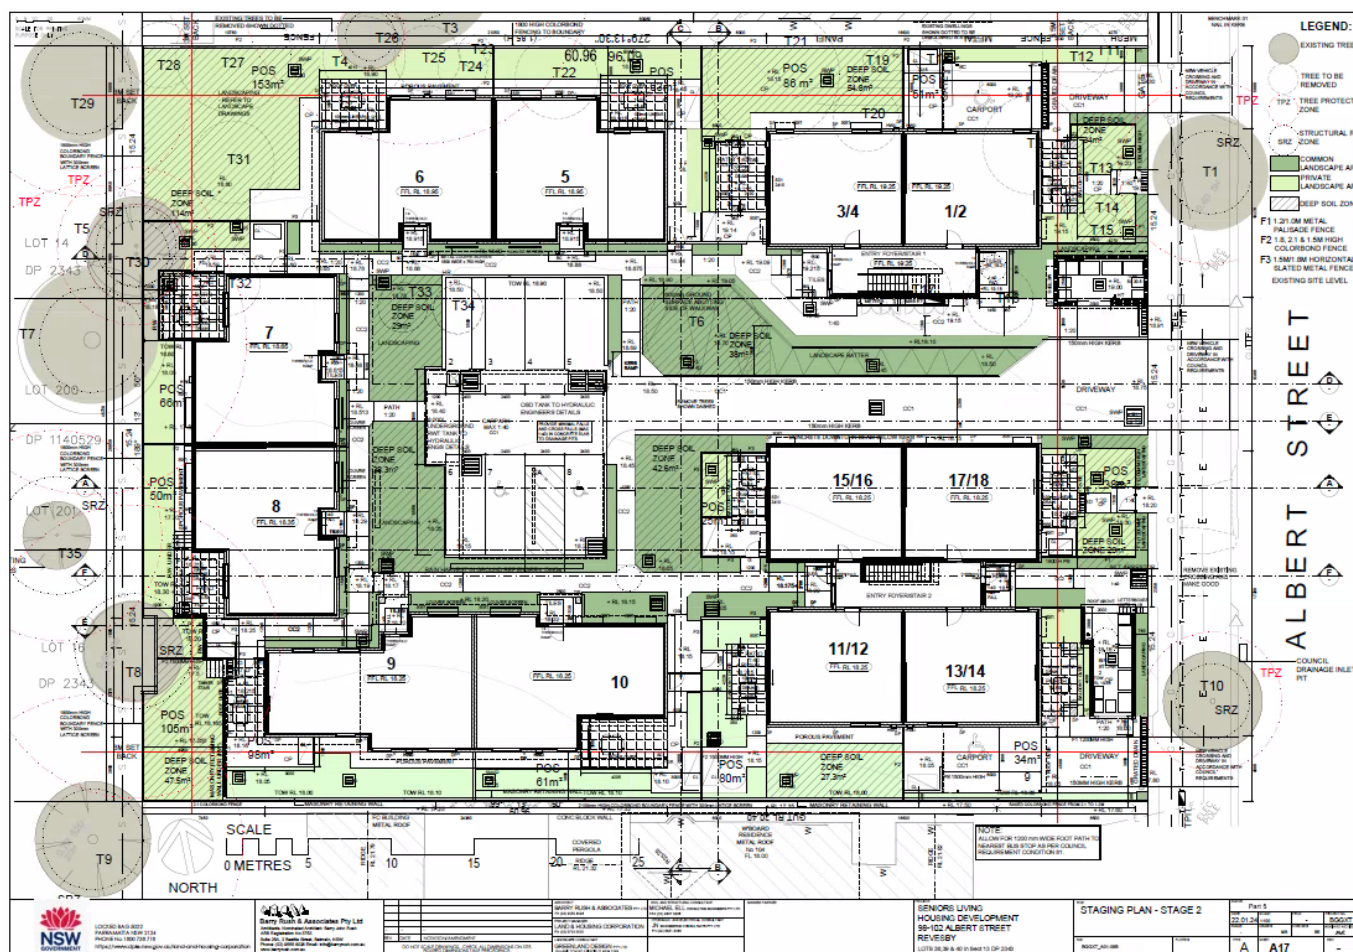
Extract of Architectural Plans – stage 2 (Source: Barry Rush Architects)
